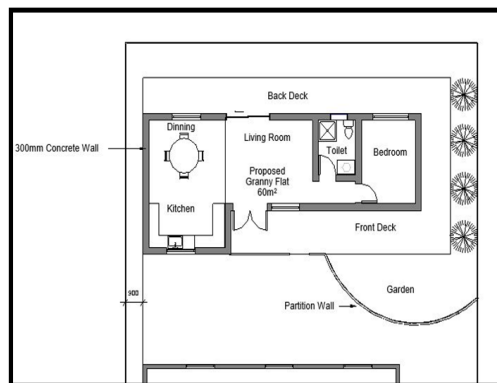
Proposed Granny Flat Floor Plan (self designed)
